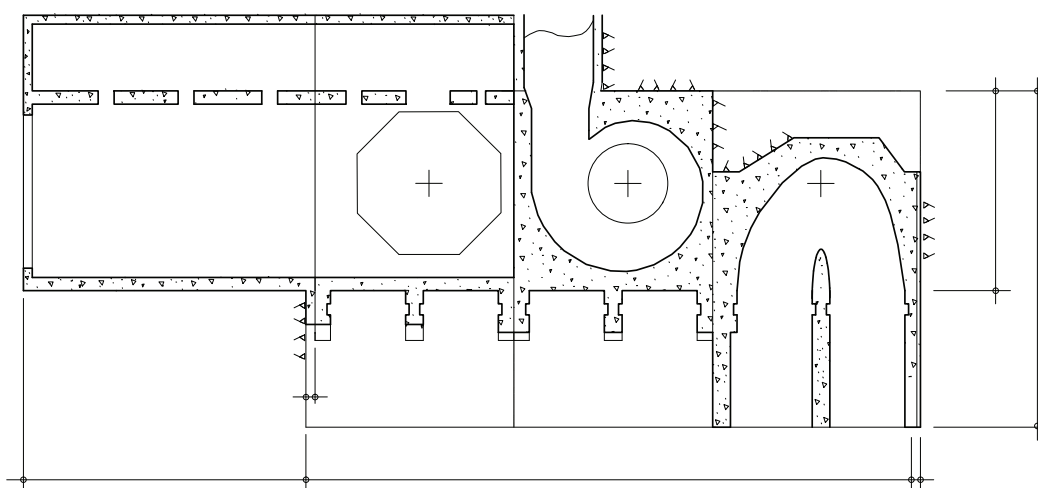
Plan of the powerhouse and assembly area for Kaplan turbines with a steel spiral casing.
